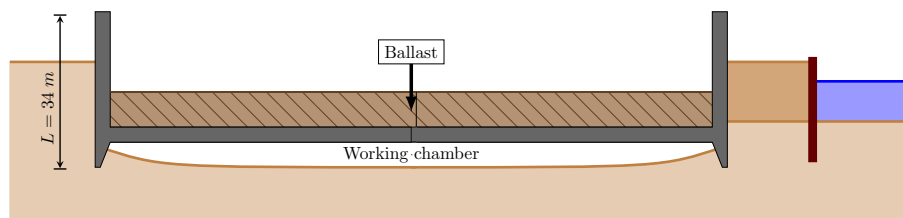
Step 4 - Excavation inside the working chamber and addition of ballast
